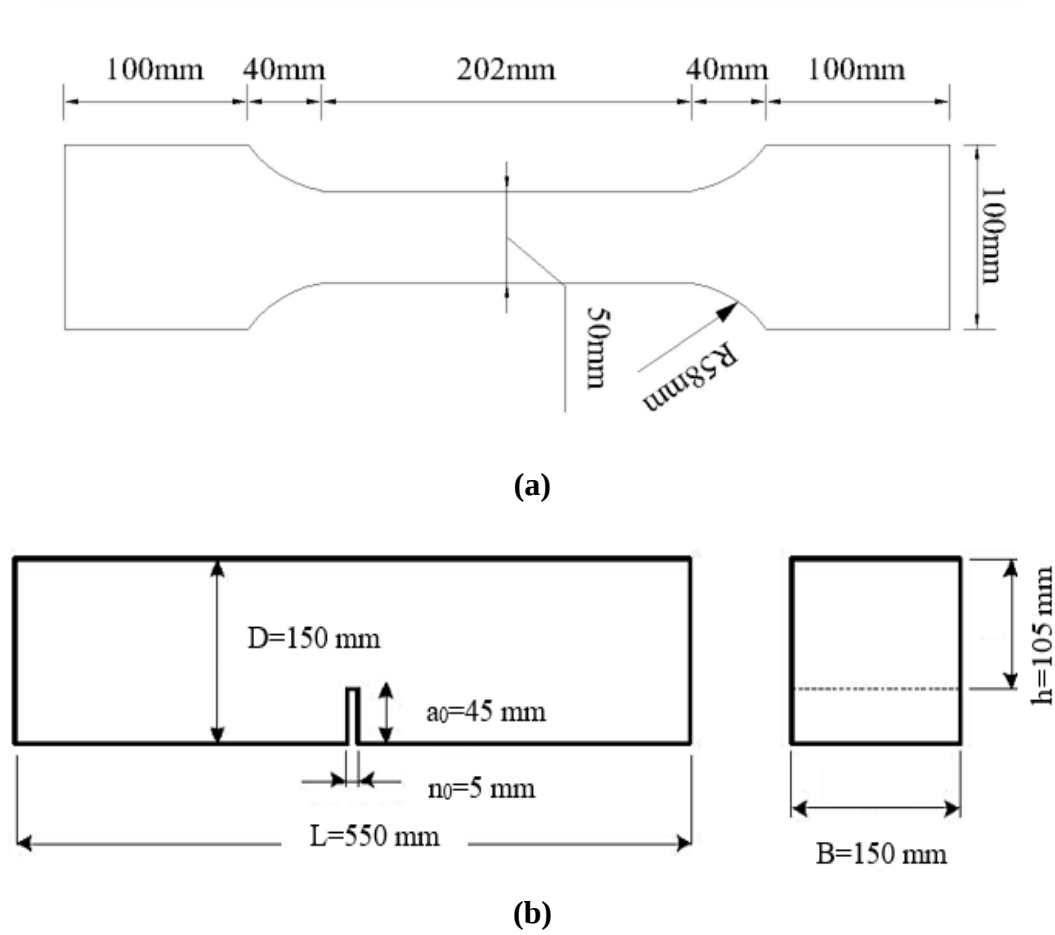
Dimensional details of specimens for (a) direct tension test of dog-bone-shaped specimens, and (b) flexural strength test of the concrete beam.
